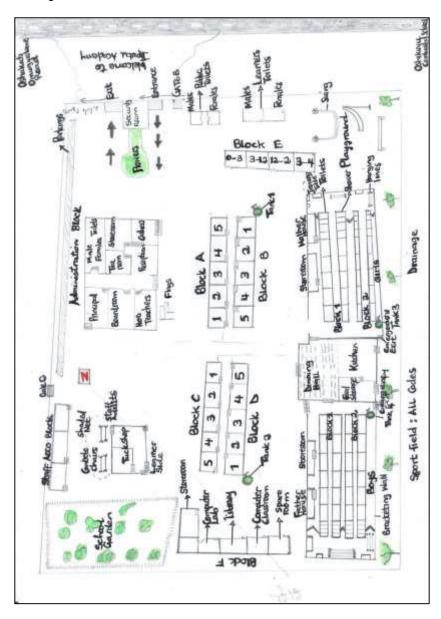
The preliminary hand-drawn layout of the liputu Private School
